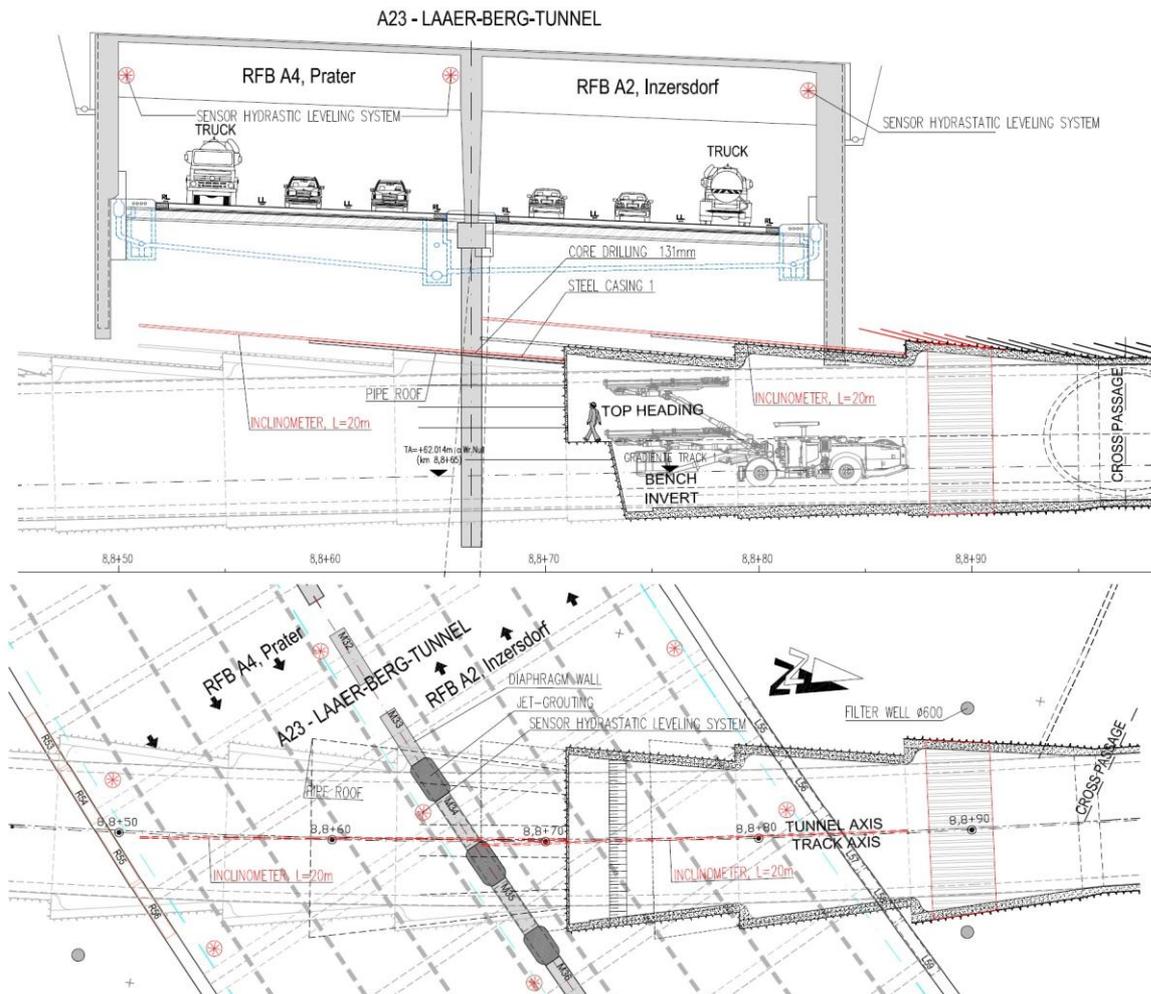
Running tunnel cross-section under the A23 Laaerberg tunnel (Ref. [2])
